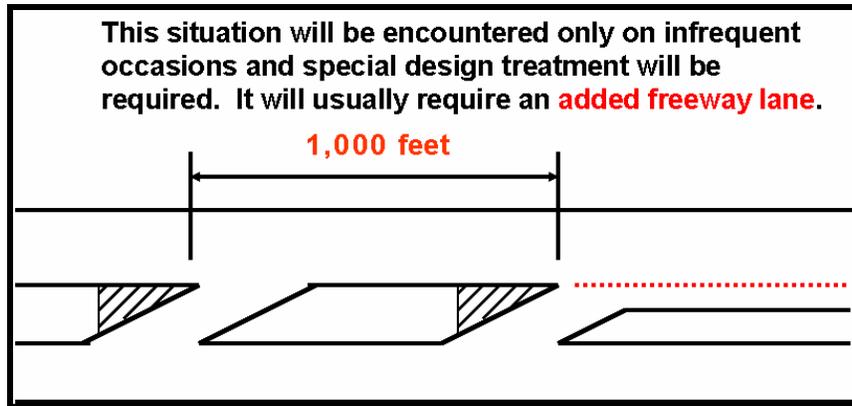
Distance between Successive Ramps – Case 3 (II).
